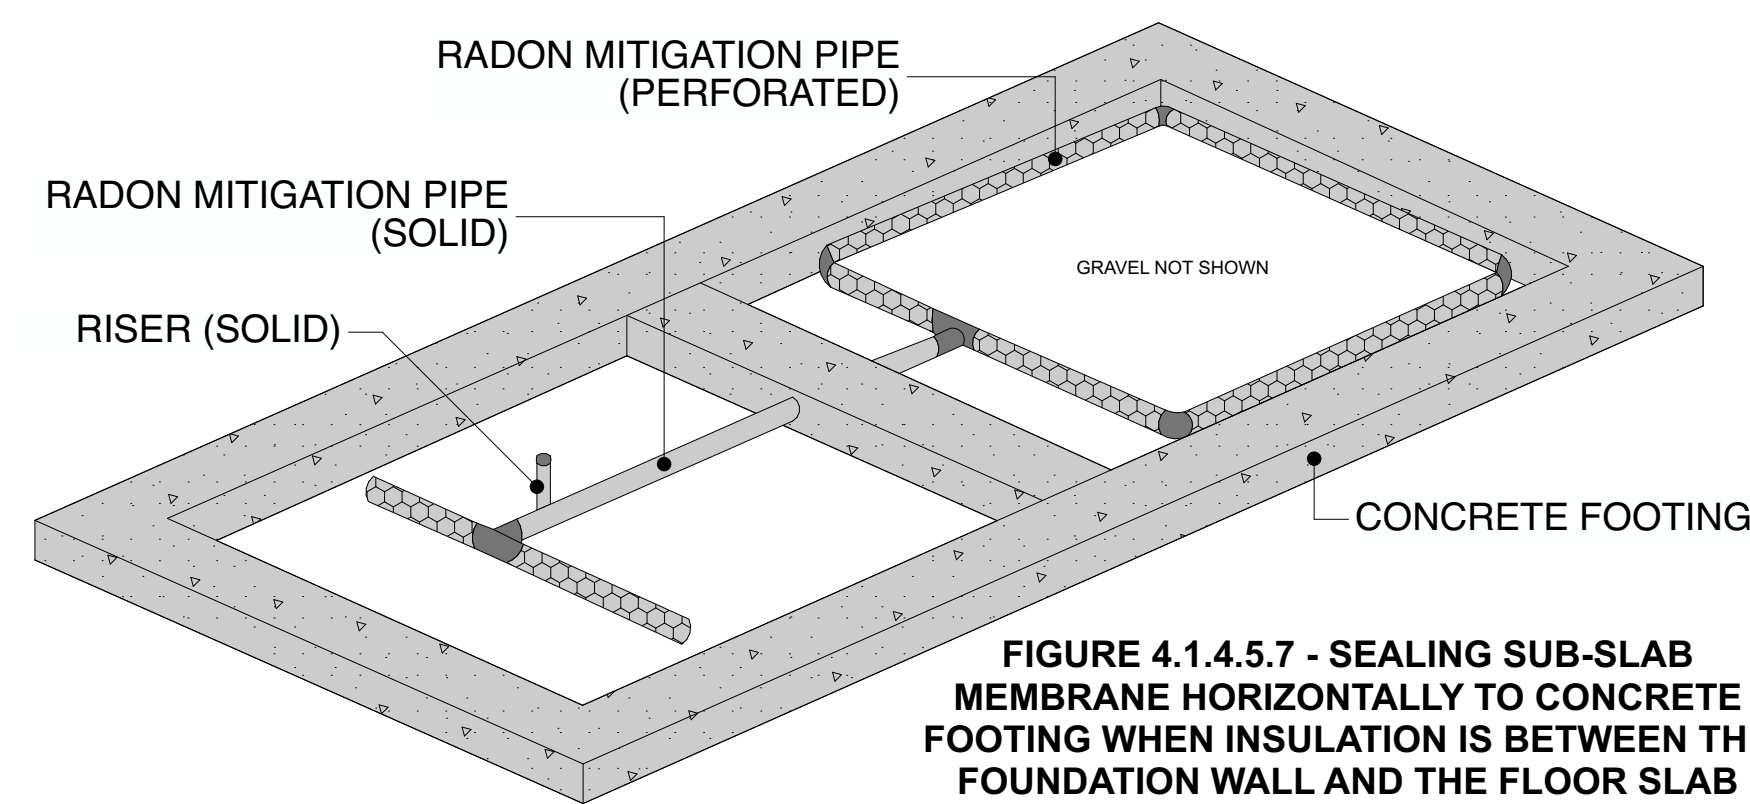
SEALING SUB-SLAB MEMBRANE HORIZONTALLY TO CONCRETE FOOTING WHEN INSULATION IS BETWEEN THE FOUNDATION WALL AND THE FLOOR SLAB
